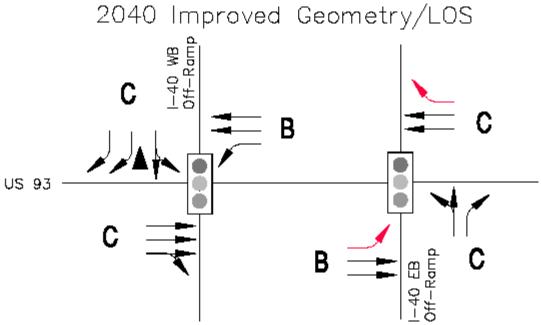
Recommended Intersection Improvements with Direct Connect Ramps
